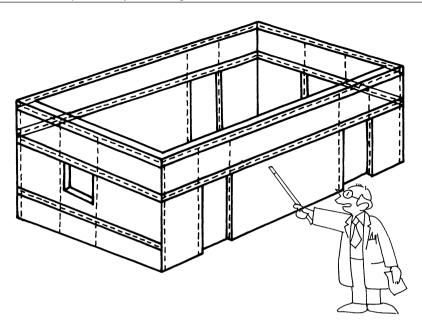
Buildings are designed to withstand earthquake forces without causing collapse of any of its parts including the foundation. Parts of a building are held together by constructing beams at sill, window, and roof levels, to improve its seismic response
